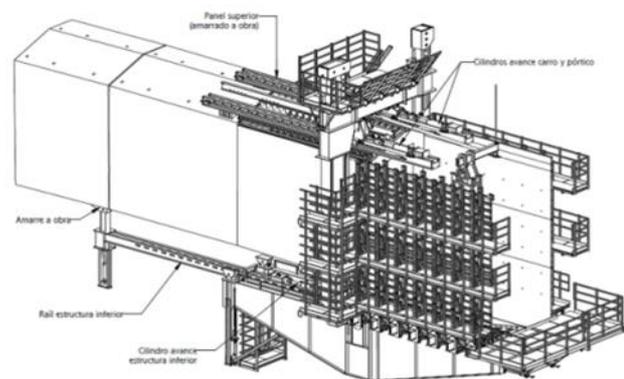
3D Model of the formwork travellers used in the construction of the arch
